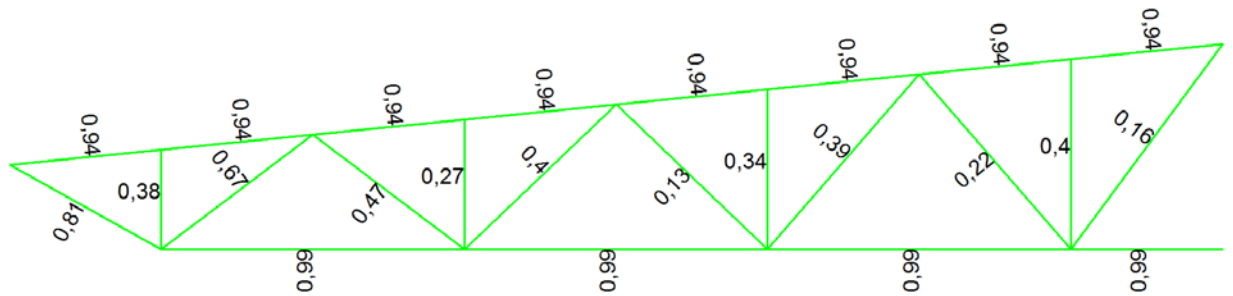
Elements efficiency in 24 meters span truss elements with 2.9 tnf/m loading
